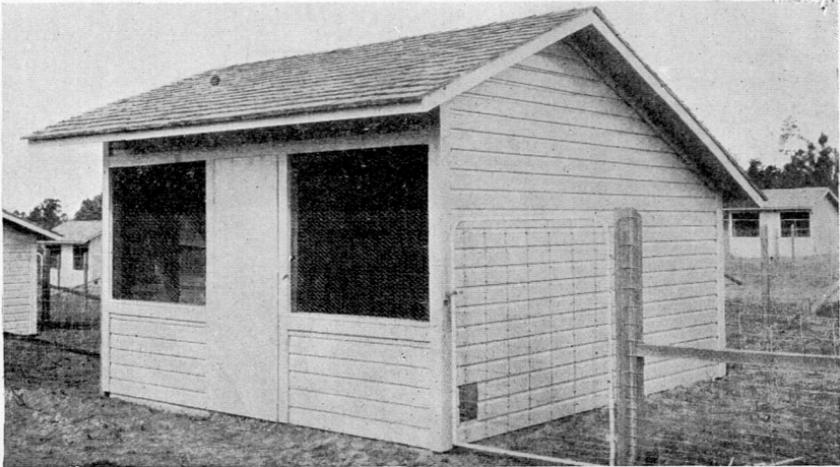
A two-thirds span laying house in use at the Florida National Egg-Laying Contest, Chipley. Size 12x14 feet.
